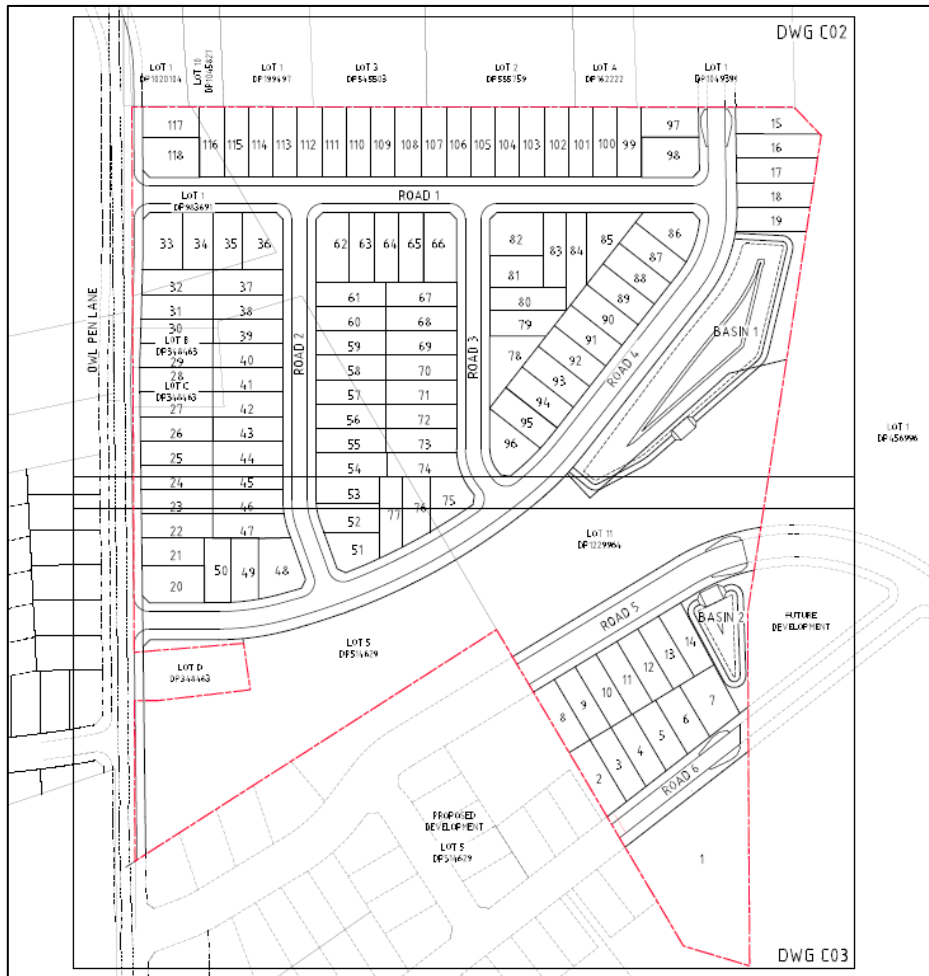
General Arrangement Plan (Prepared by GCA Engineering Solutions)
